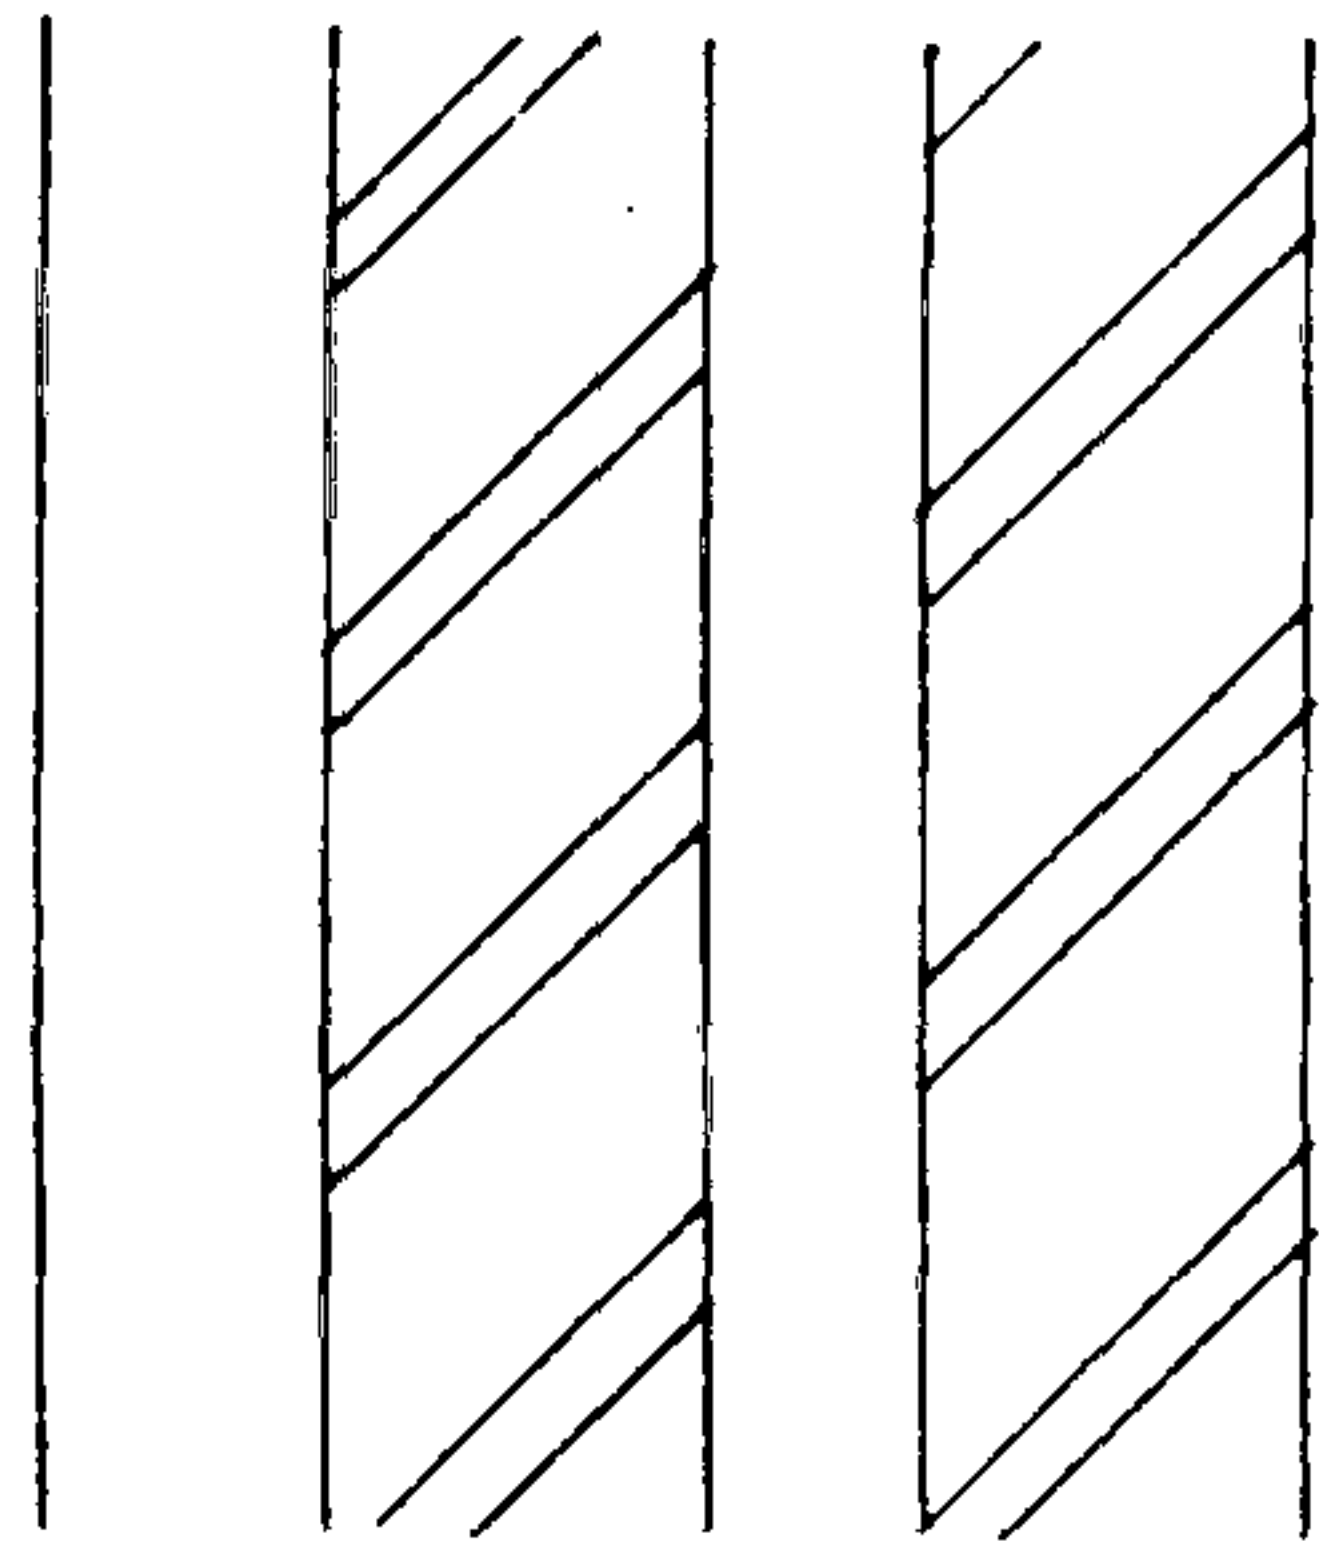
CAVITY BRICK WALL: SINGLE GLAZED
